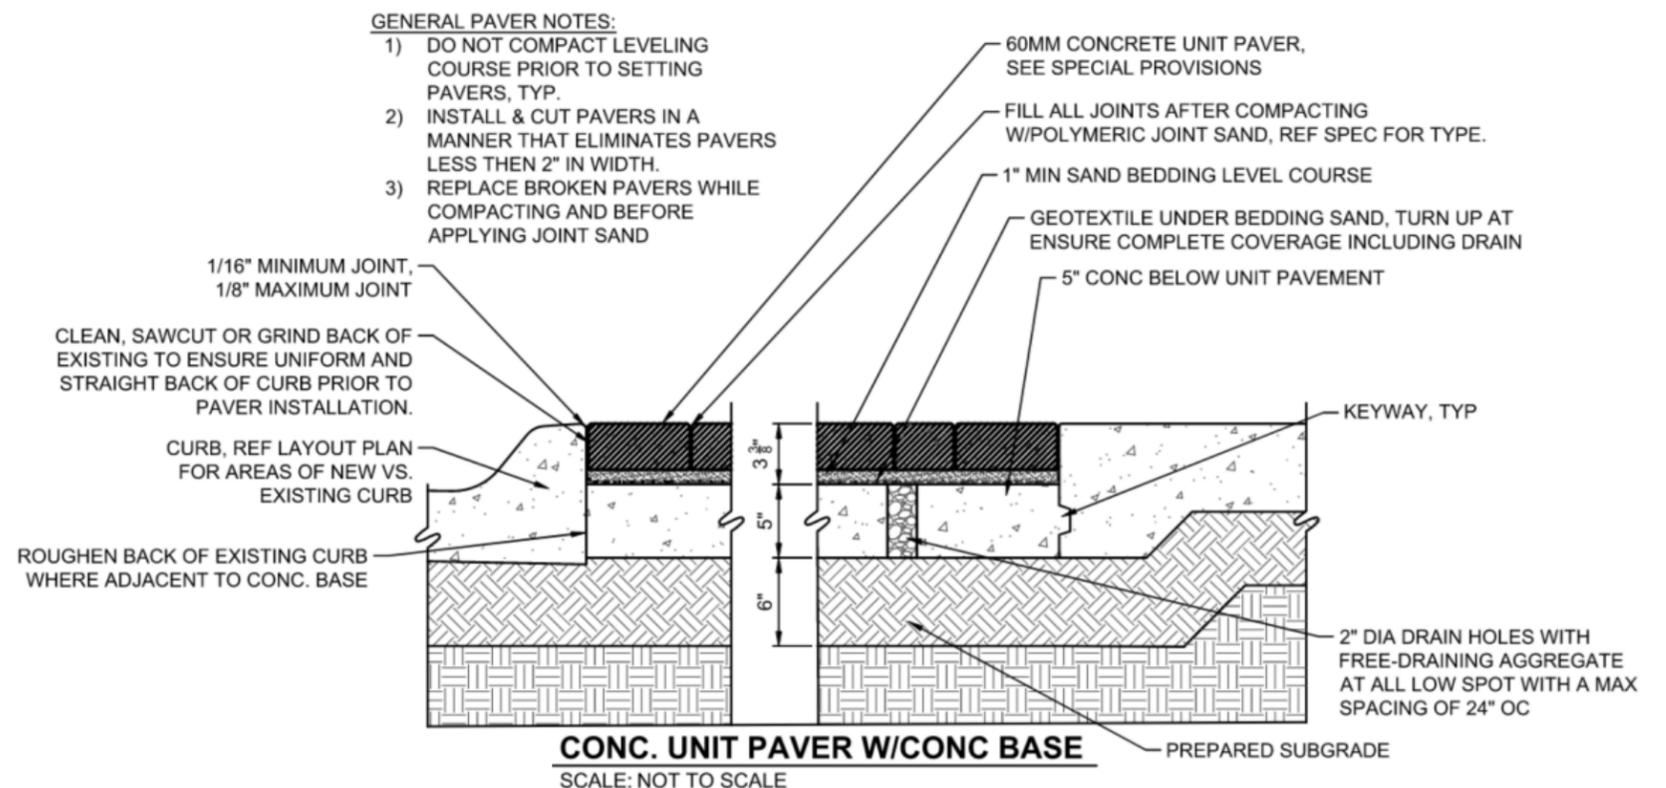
Examples of Construction Methods Integrating a Concrete Base or Tub into Brick Sidewalk Construction
